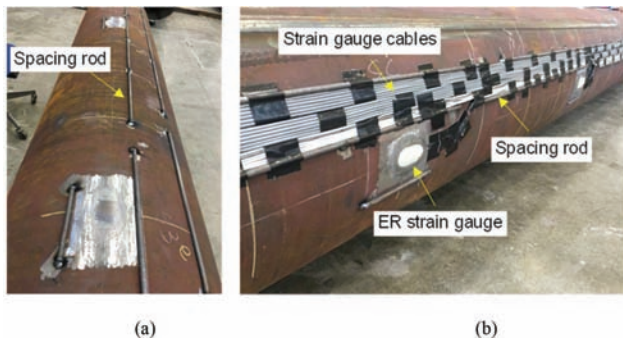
Instrumentation details for the inner pipe of the bottom segment for the open-ended test pile: (a) spacing rods welded on the surface of the inner pipe; (b) arrangement of the strain gauges and their cables on the inner pipe. (Modified after Han, Ganju, Salgado, & Prezzi, in press b.)
